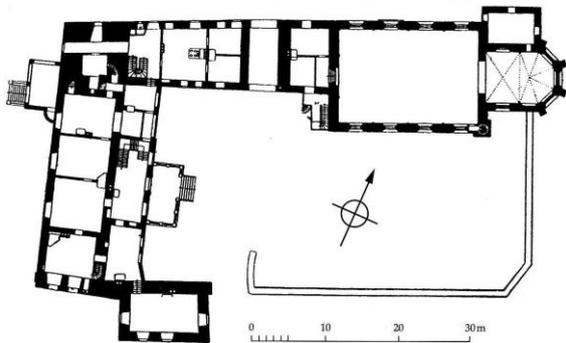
Architect Wilhelm Ludwig Nikolai Bockslaff (1858–1945). The first floor plan of Riga Archbishop Vassal's Gross-Roop Castle building complex with included church. 1909 [12, 285].
